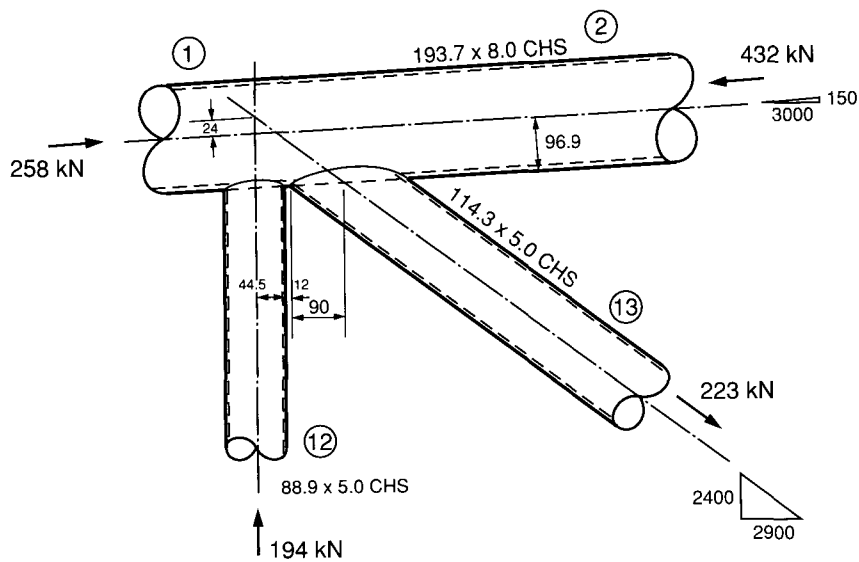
Top chord joint between members 1, 2, 12 and 13 (dimensions in mm)
